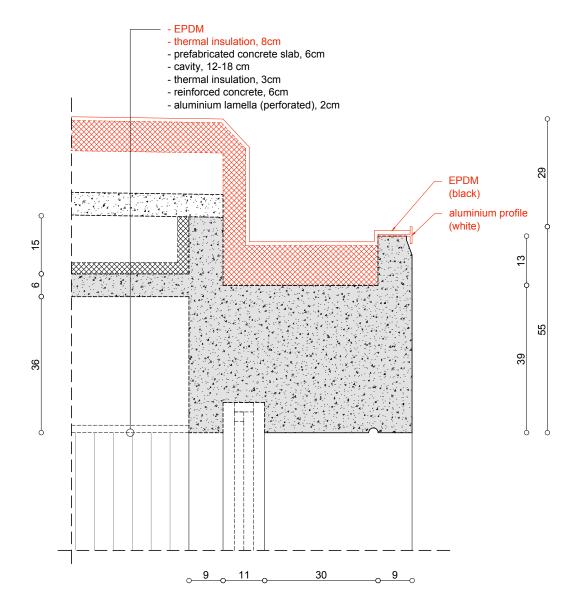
Detail eave, scale 1/2 (Antwerp: deSingel).
